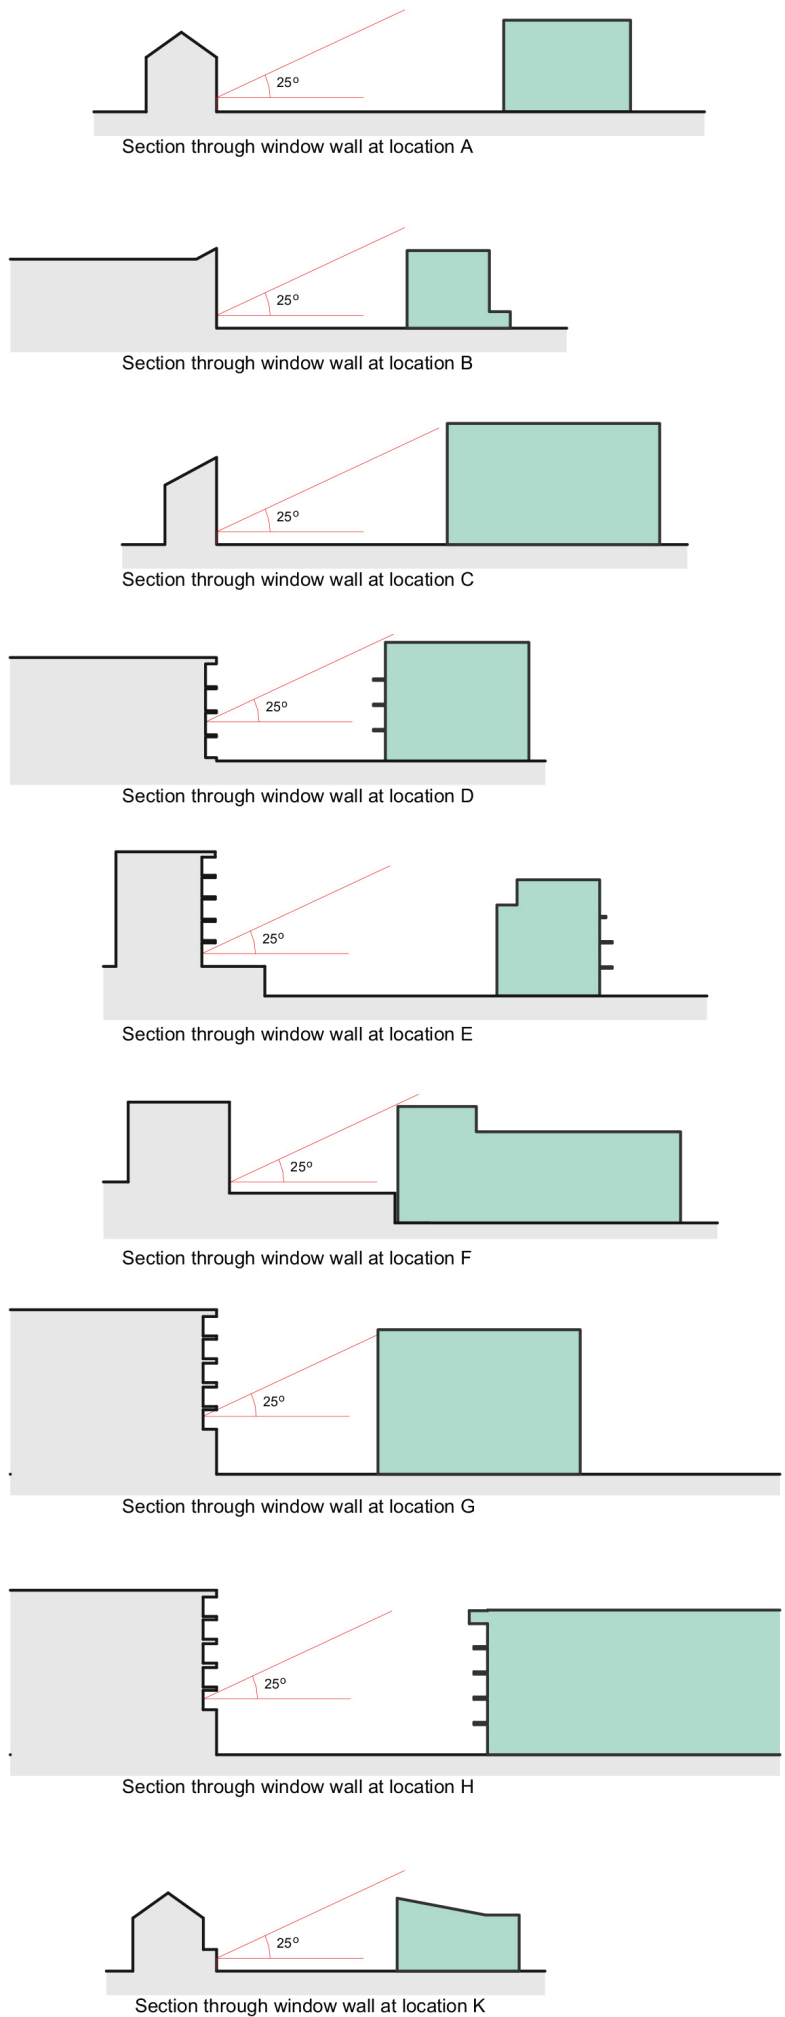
Section perpendicular to window wall at locations indicated in Figure 2.
